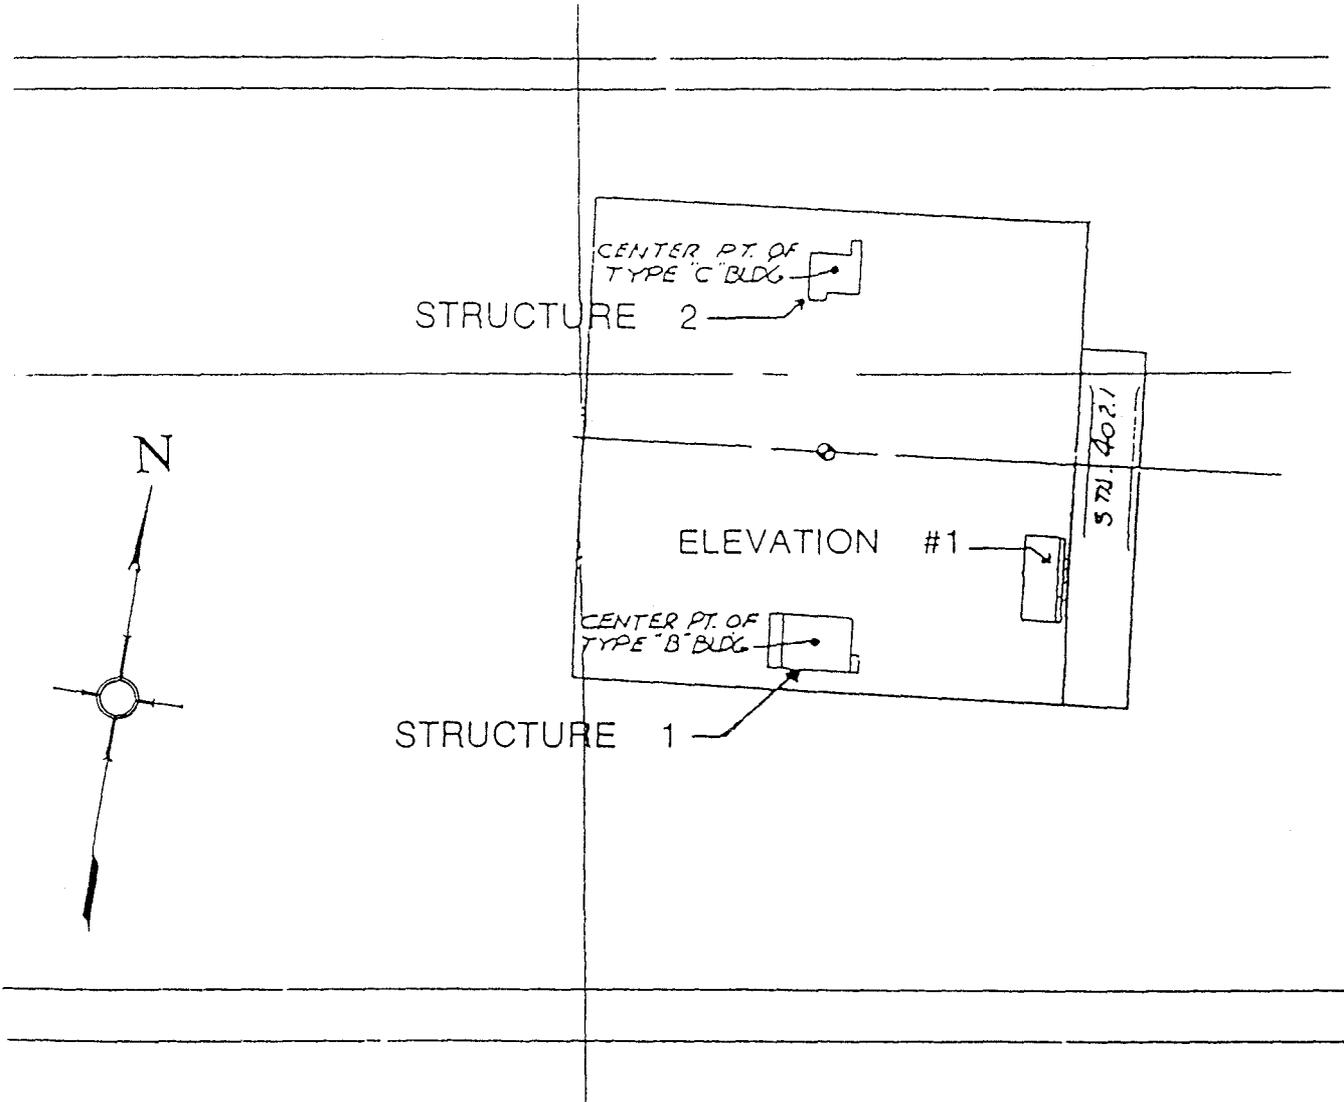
Site plan of the Japanese Village showing location of three standing structures.
